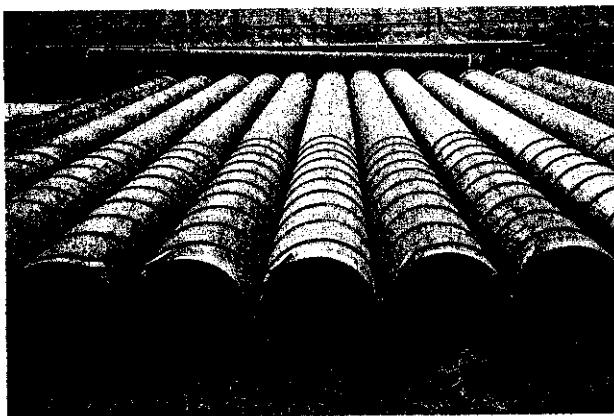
Rotary penetration steel pipe pile (drill pile method)
